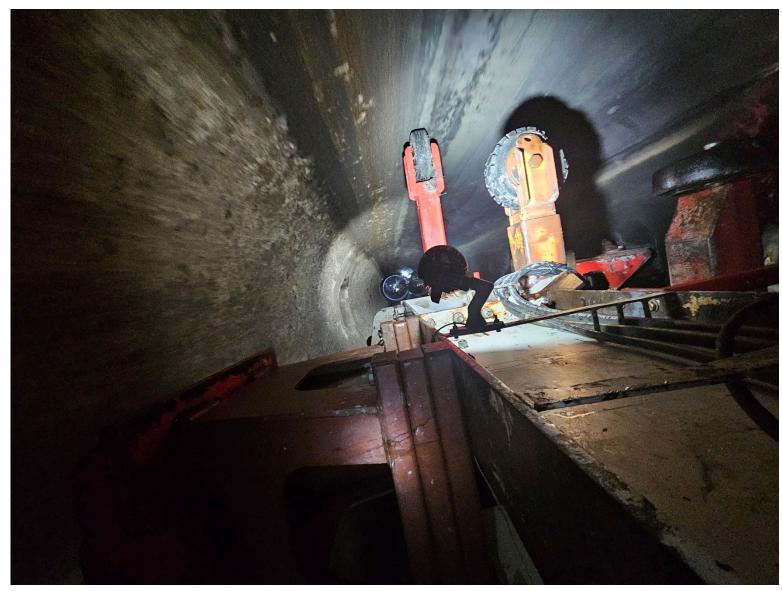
Pipe Carrier Returning to CS-12 after Setting Pipe (view looking upstream)
